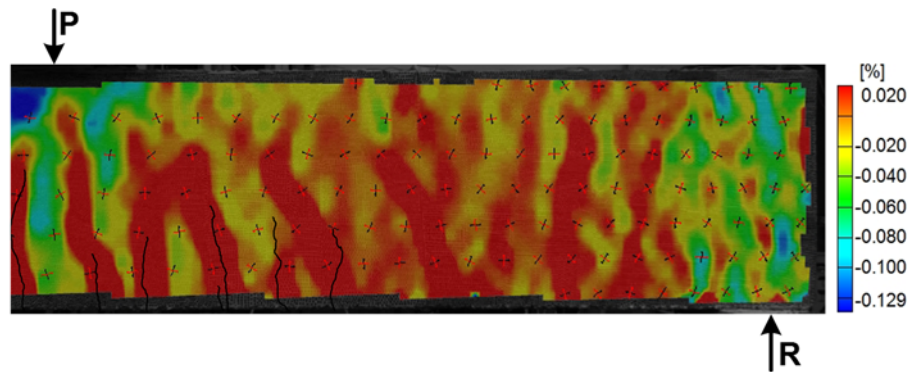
Scaled full-field concrete longitudinal strain ( $\epsilon_x$ ) across shear span for specimen RC18b at load 30 kips
